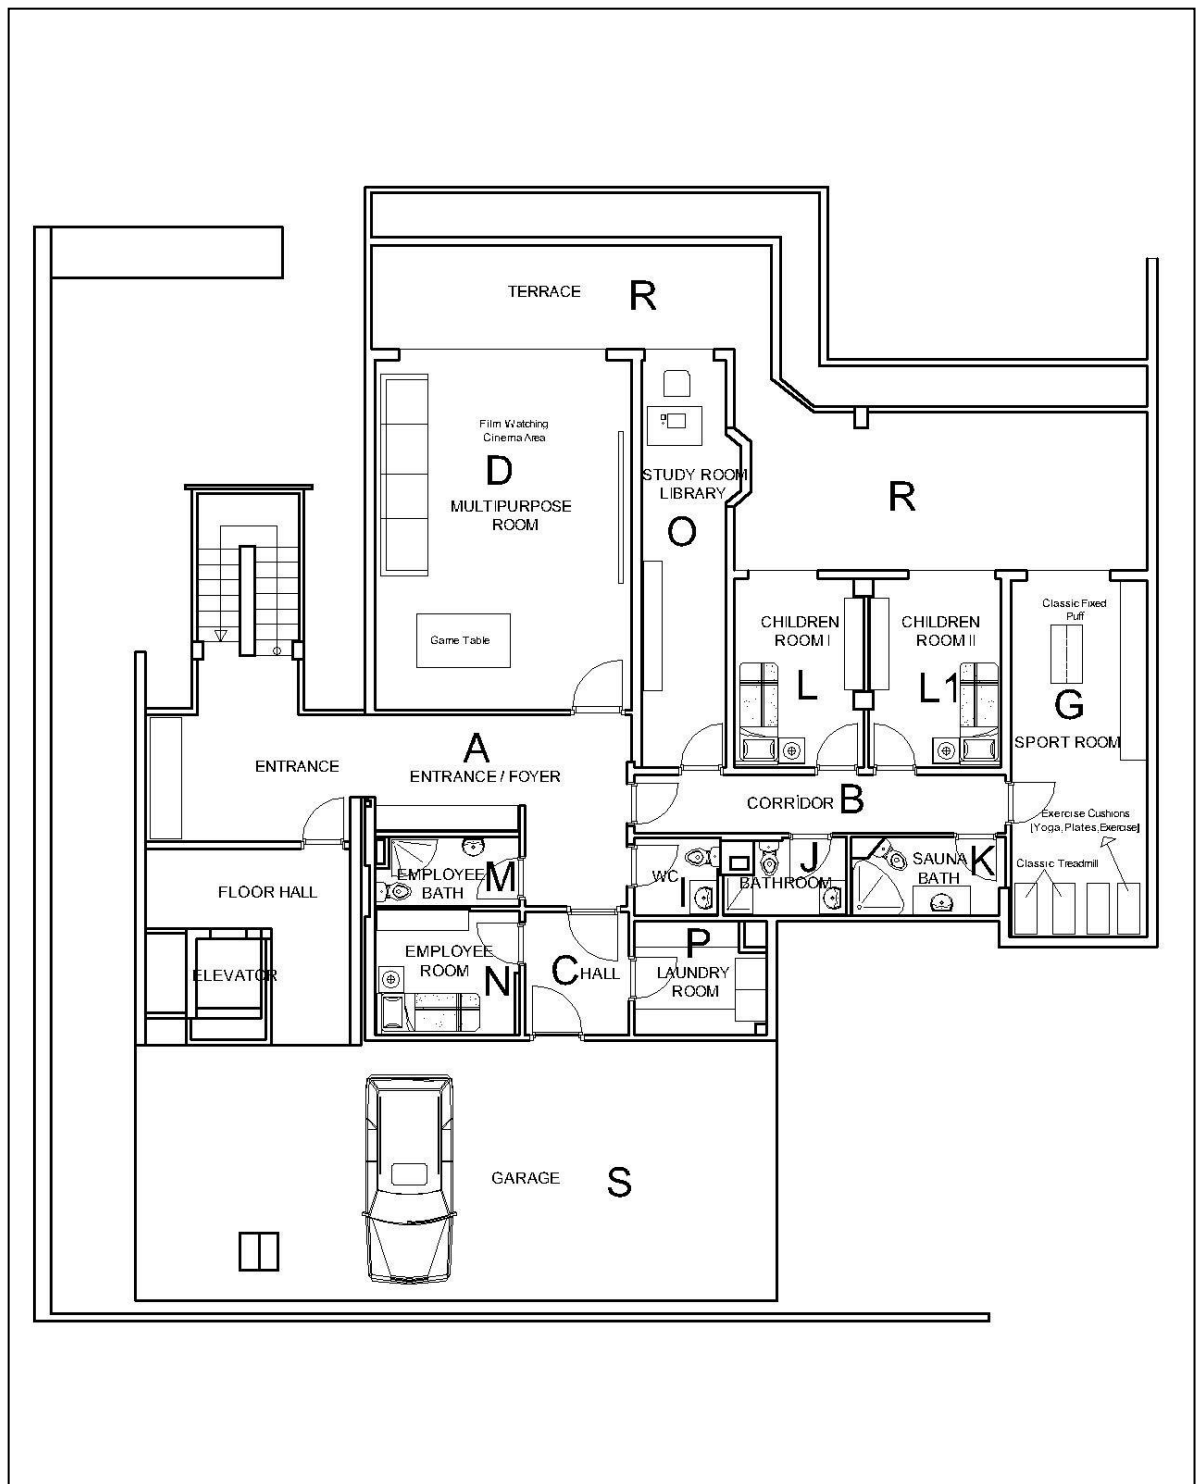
Existing ground floor plan of two storey detached house types. Standard furnishing, designed by author.
